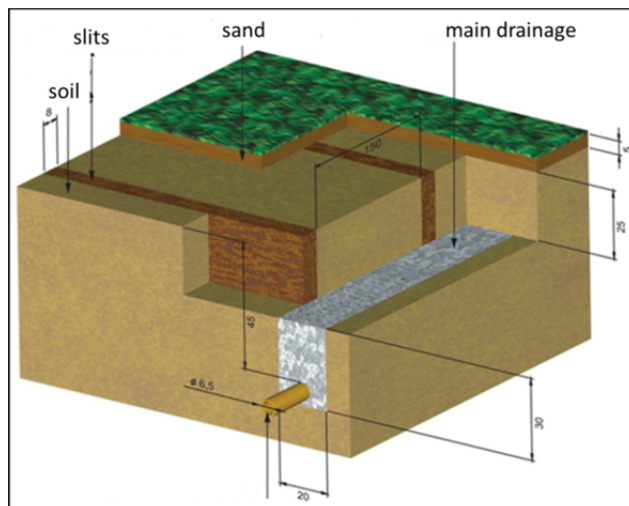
Cross-section of slit drainage system with sand topsoil (5 cm).
